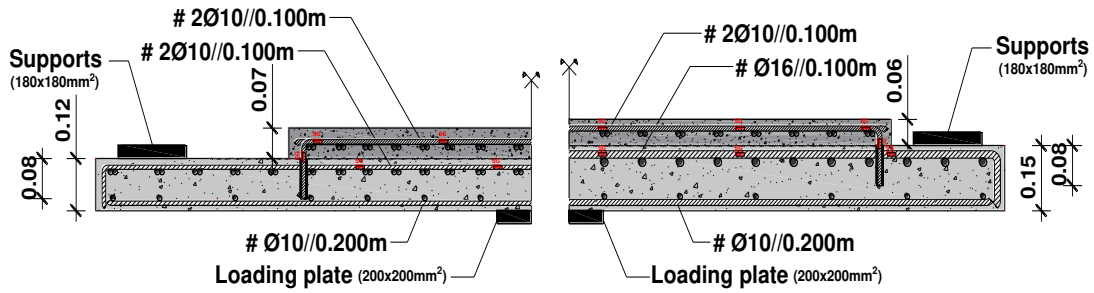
Detailing of the ANC specimen overlay reinforcement –  $S_{3D}$  and  $S_{4D}$ .
